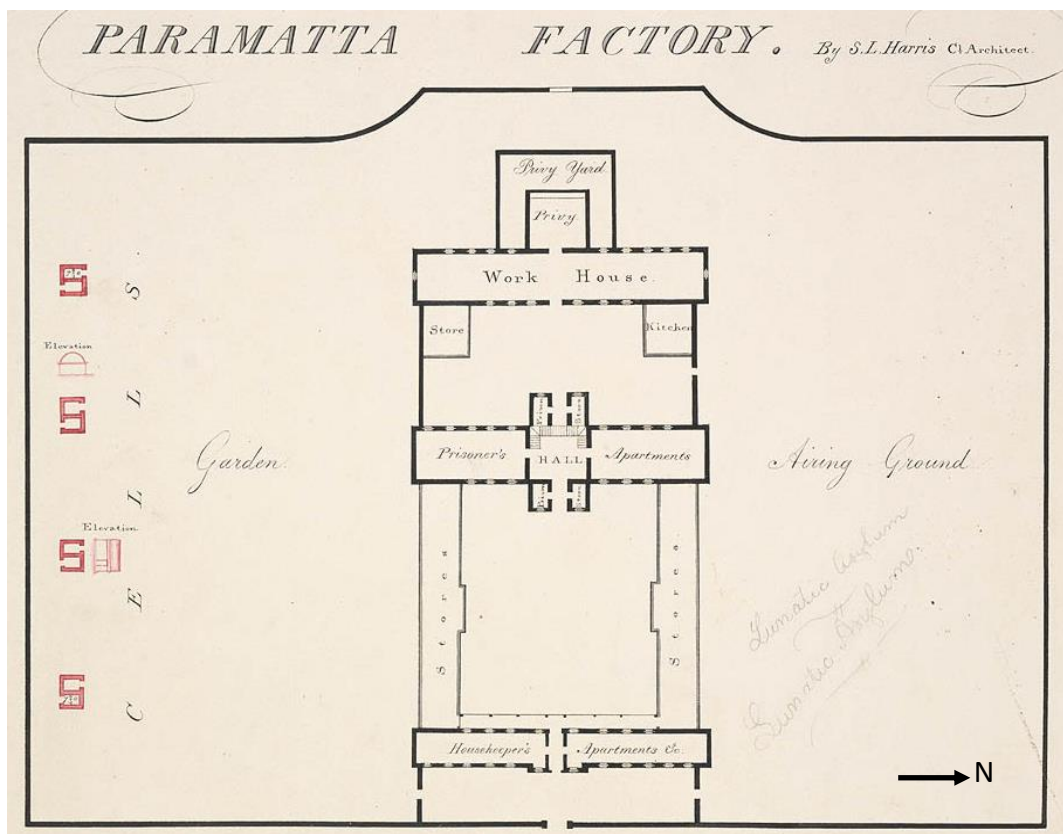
This 1823 plan of the Parramatta Female Factory is not considered to be particularly accurate. The main difference from the original group of buildings appears to be the new southern workhouse and associated privy yard. SL Harris' plan of the Female Factory, 1823, C 226, ML SLNSW.
